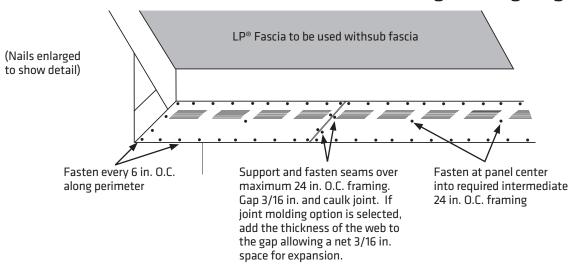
16 in. & 24 in. Cut to Width Nailing Framing Diagram
